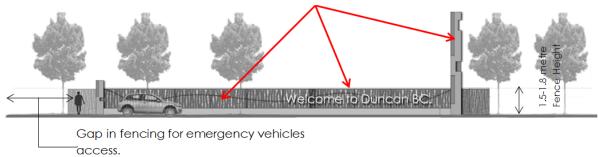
Gateway Improvement Examples at the Cowichan River Bridges
